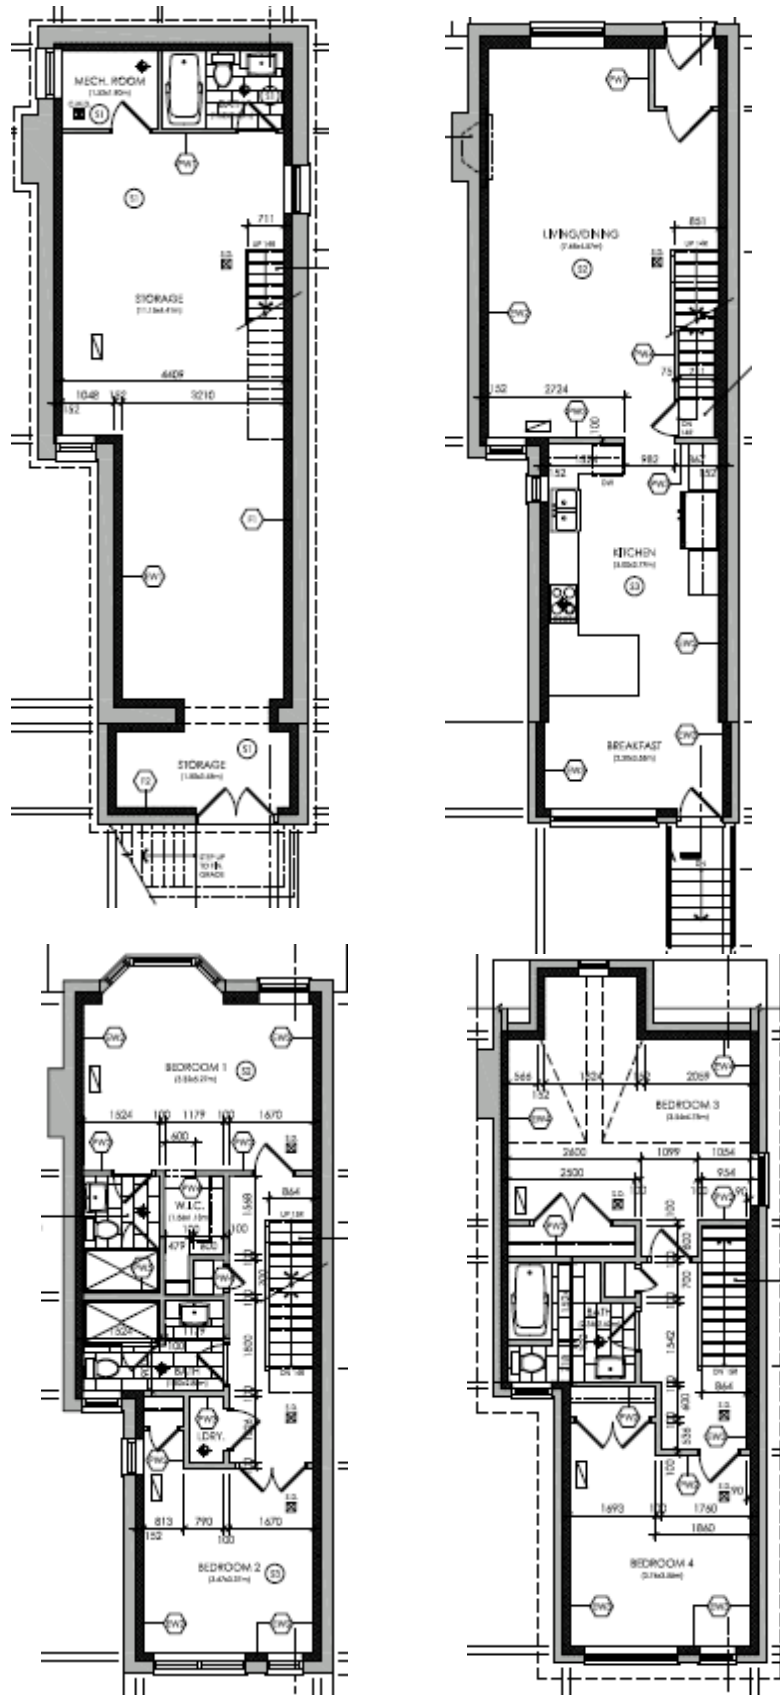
Basement floor plan (top left); ground floor plan (top right); second floor plan (bottom left); third floor plan (bottom right).
